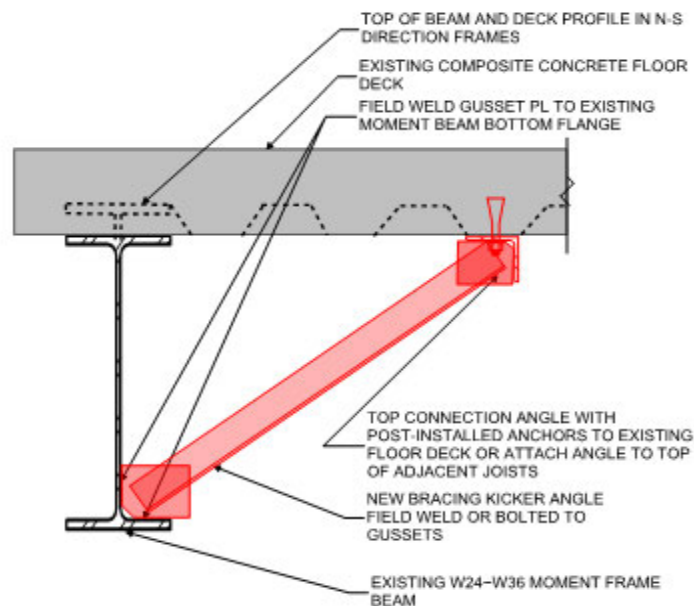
Moment Frame Beam Bracing with Kicker Angle
